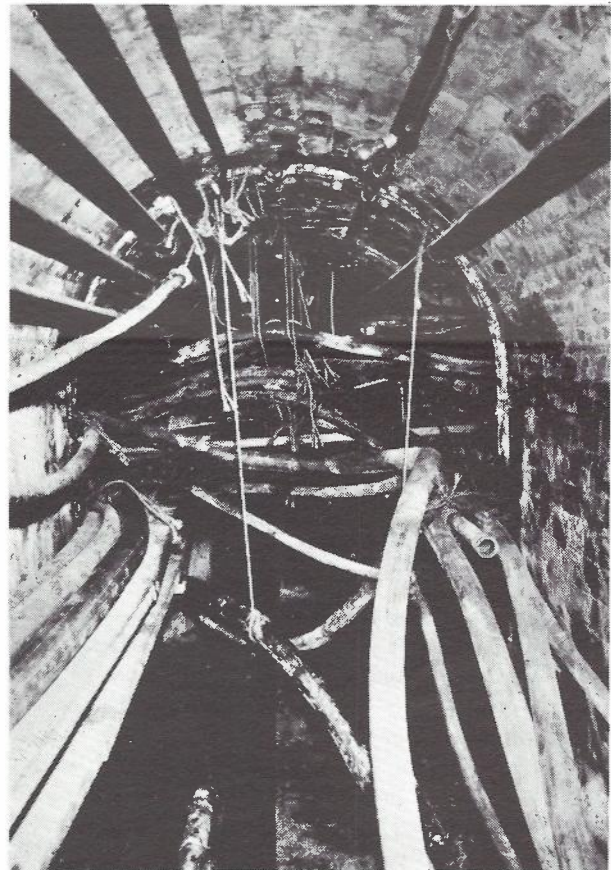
Intersection, York St. and Barrack St. Tunnels.
